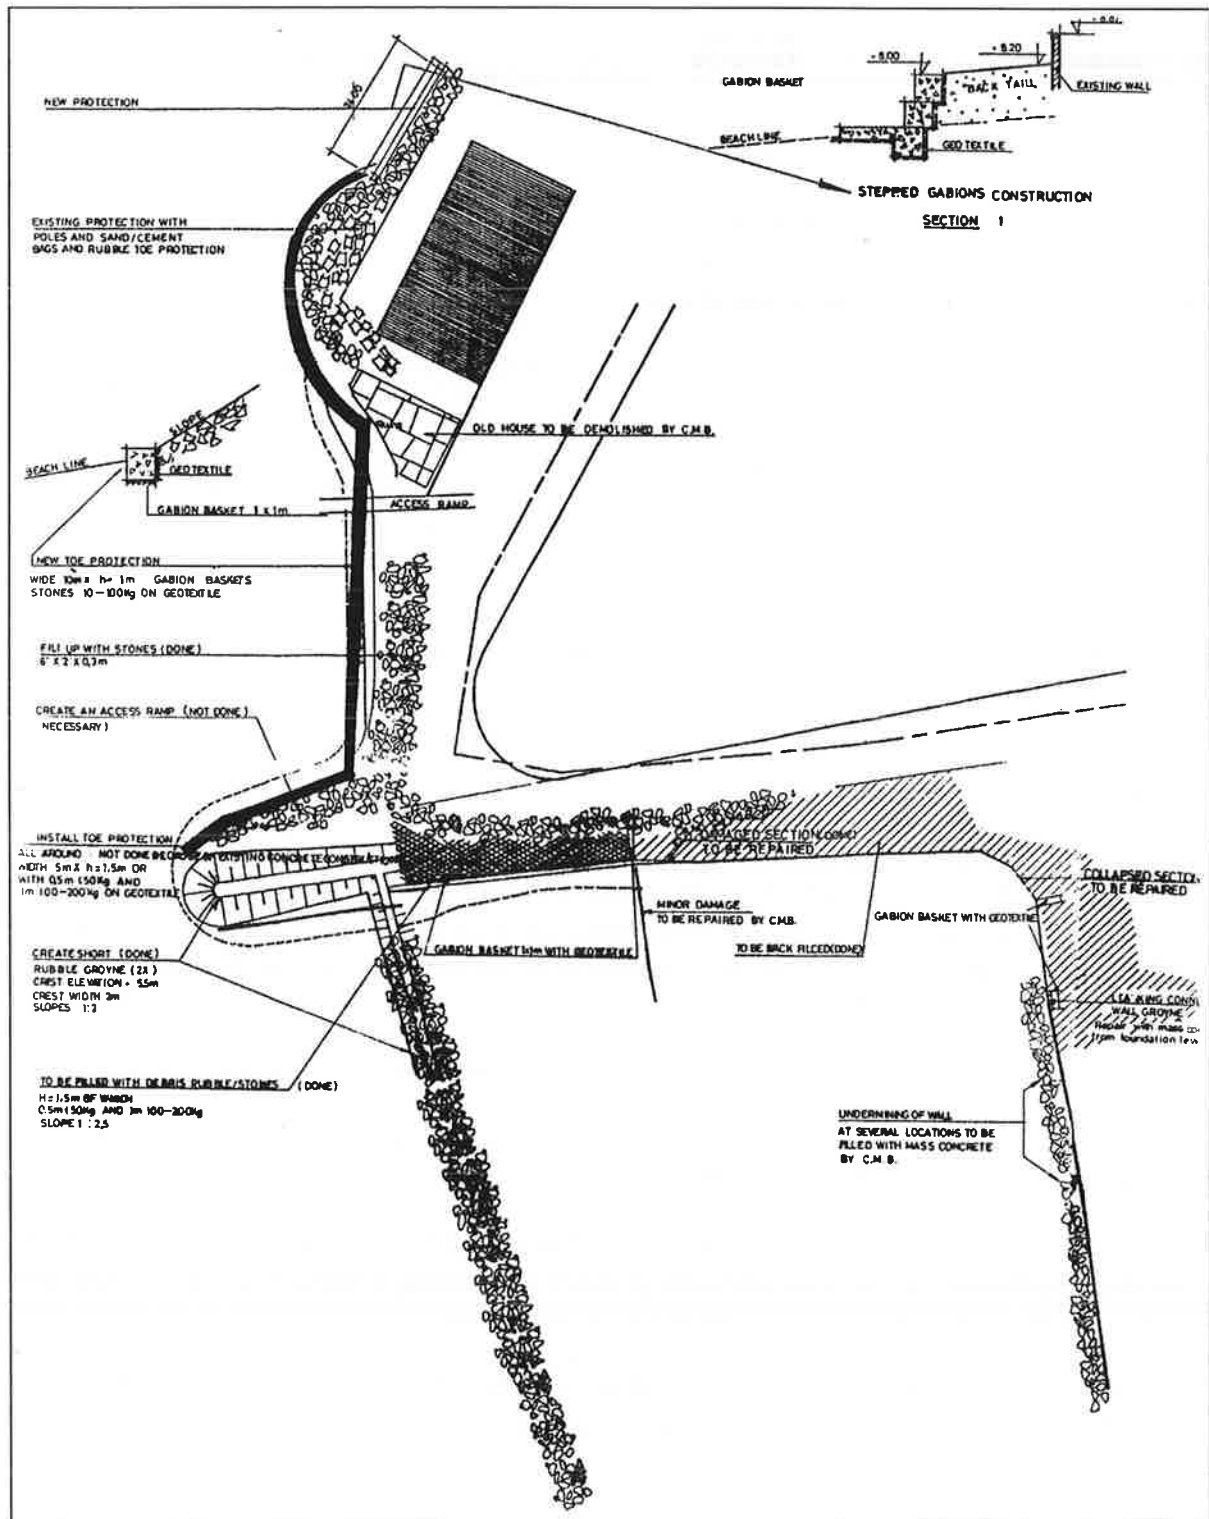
General plan of Ponta Gêa headland and the works executed by Rumdel
